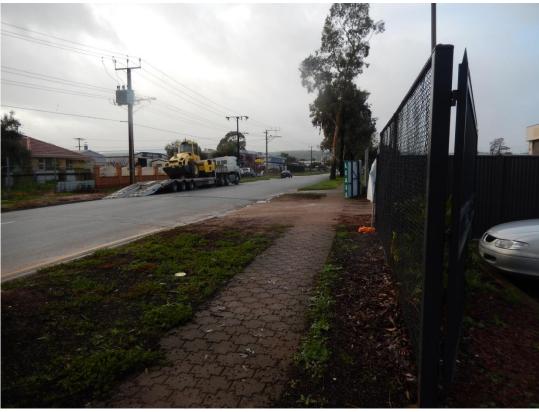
View of Stanbel Road, Salisbury Plain. View toward Main North Road, south east.
